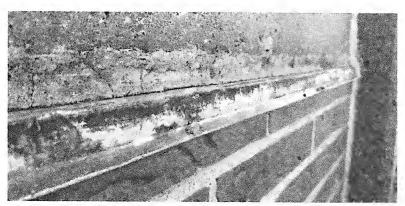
Cracked mortar and organic growth at mortar joint between brick and concrete perimeter beam soffit
